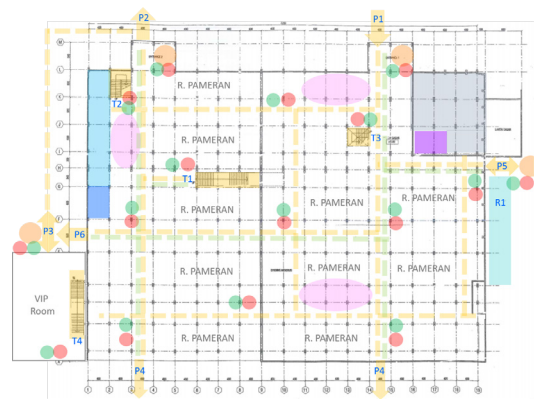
Layout and circulation of exhibition hall, 1st floor
